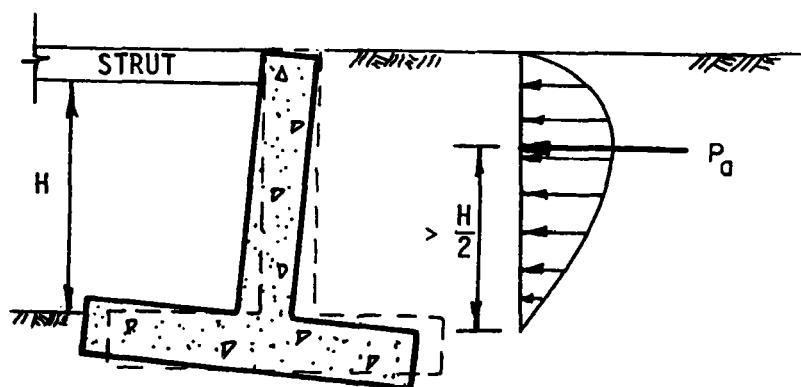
PRESSURE DIAGRAM - WALL ROTATING ABOUT TOP
